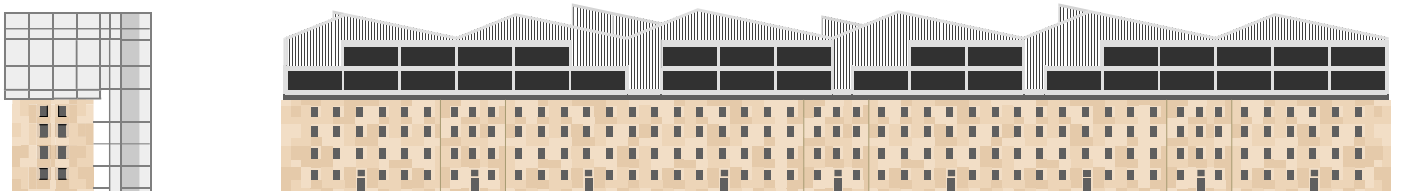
Building Elevation / South-East + South-West / M 1:1000
